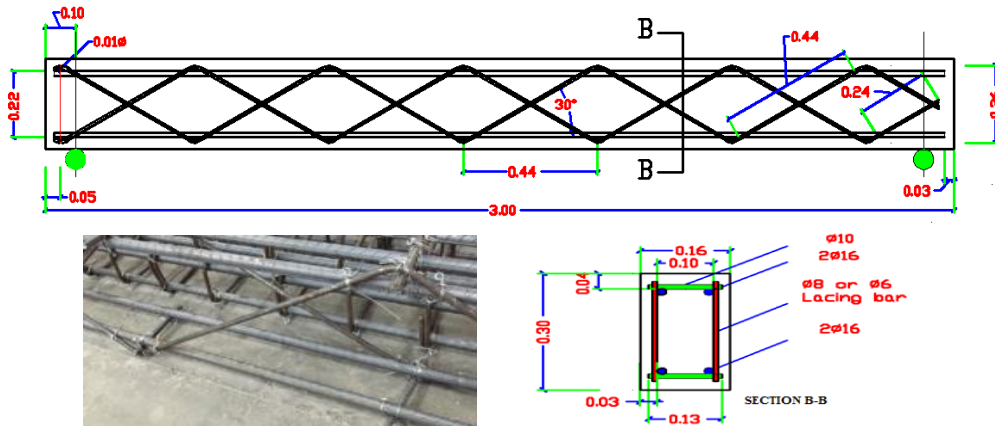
LRC Beams with angle 30° lacing inclination to horizontal.
